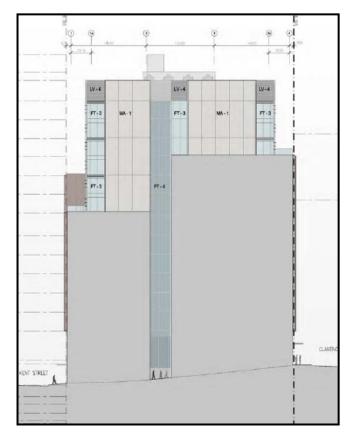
Southern elevation of the proposal illustrating 4m setbacks
